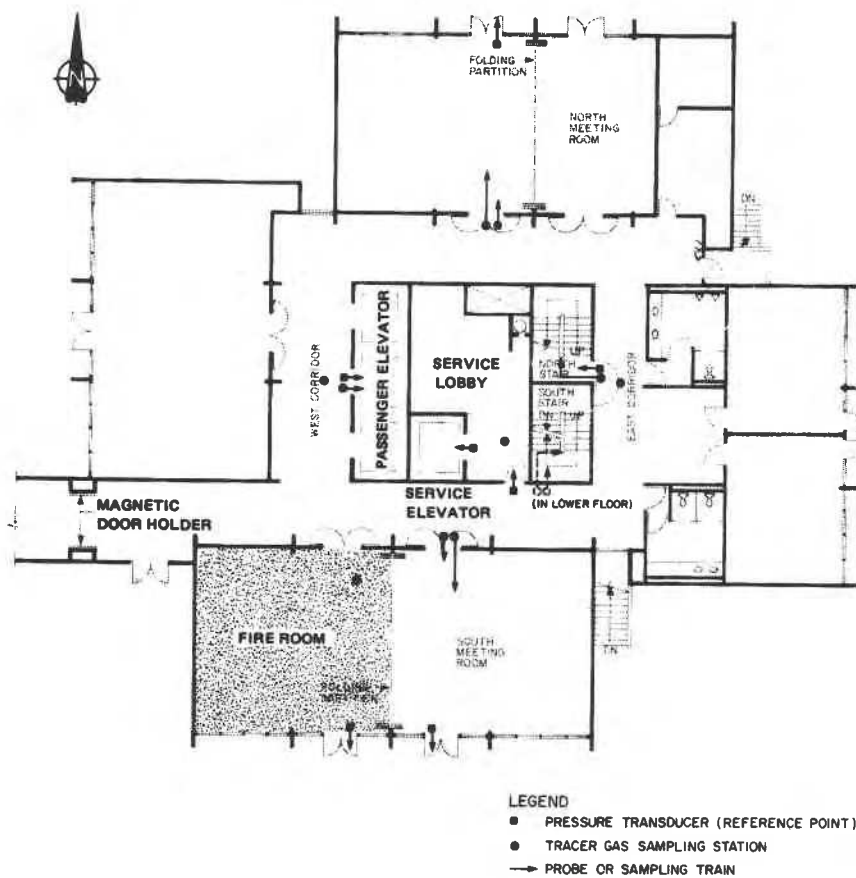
Main floor plan - pressure difference and tracer gas sampling locations
